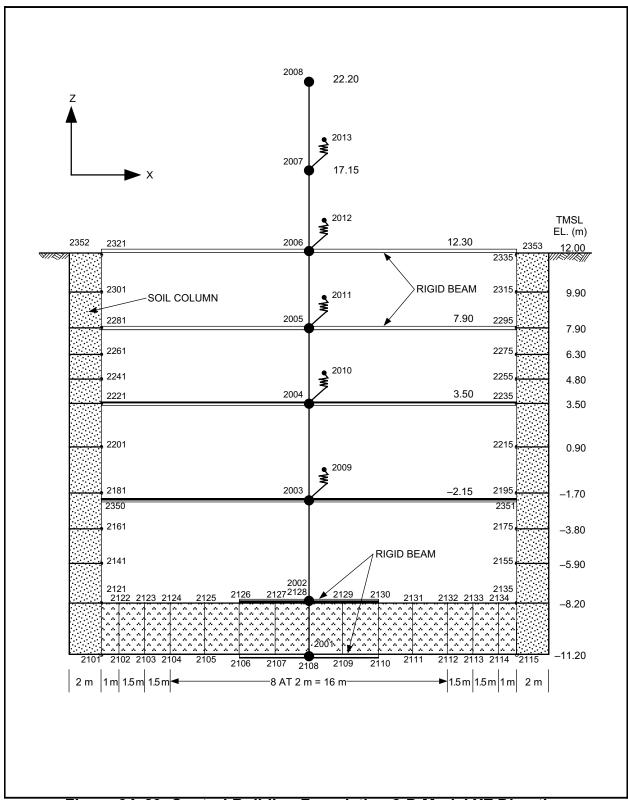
A-29 Control Building Foundation 2-D Model XZ Direction
